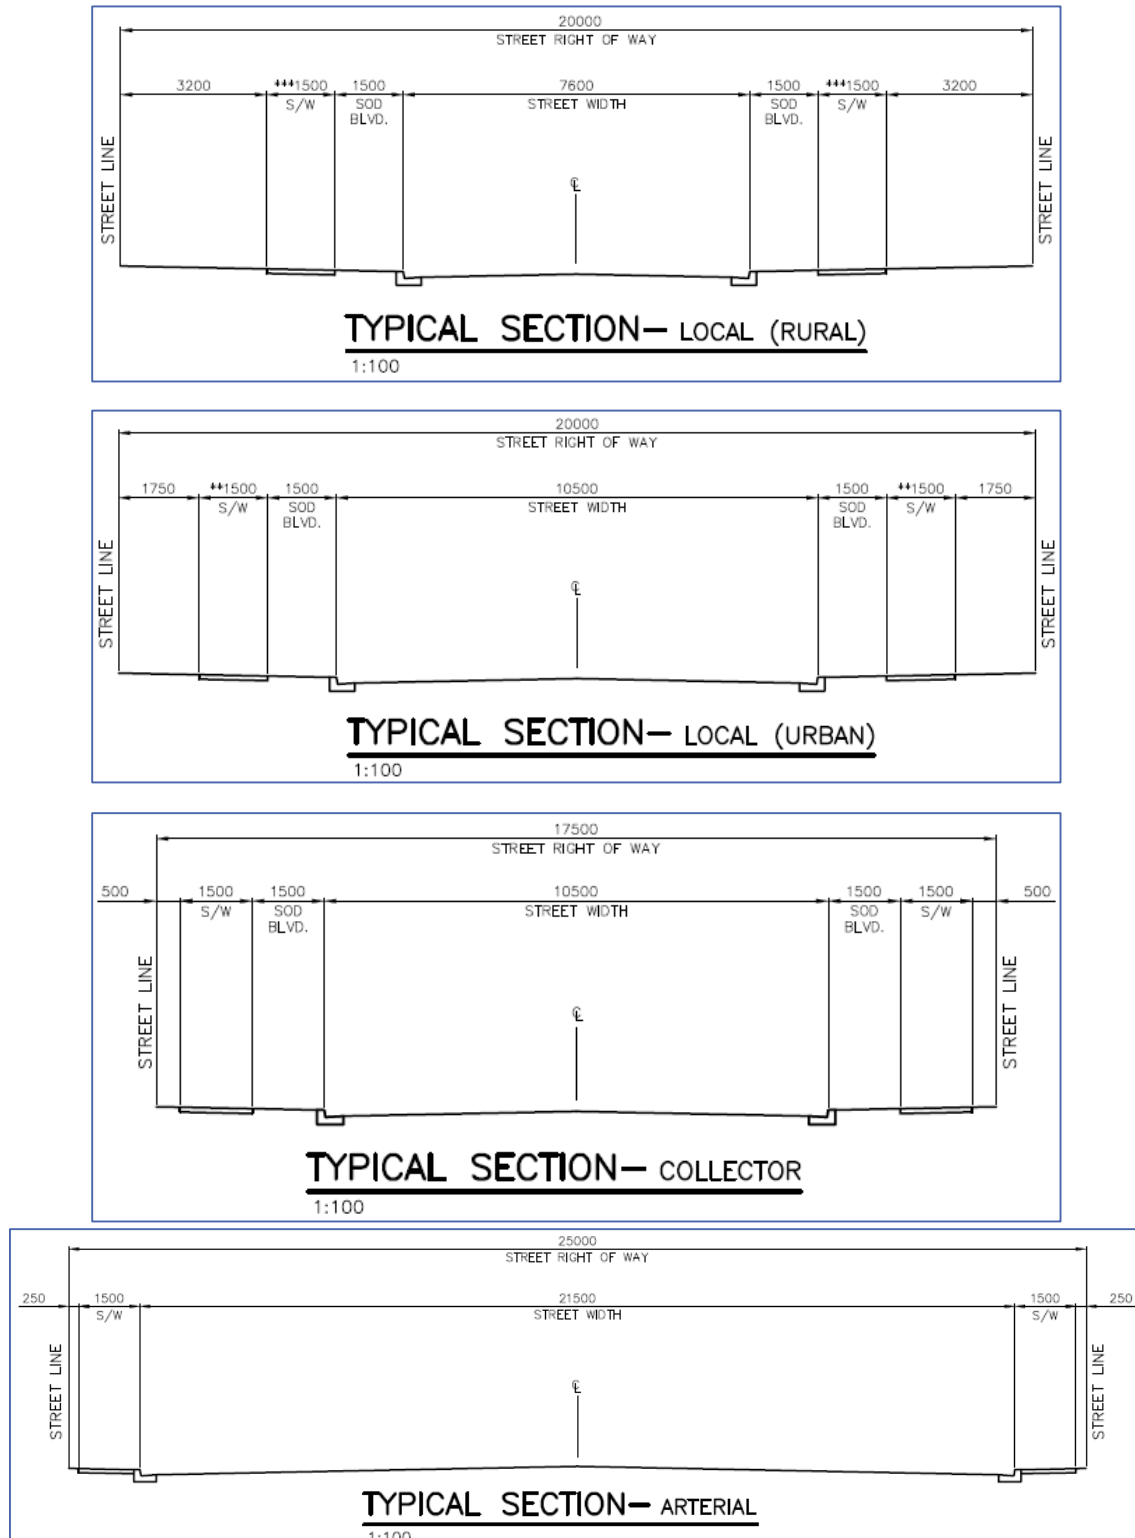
Typical cross sections for design of new roadways throughout the Town of Torbay
